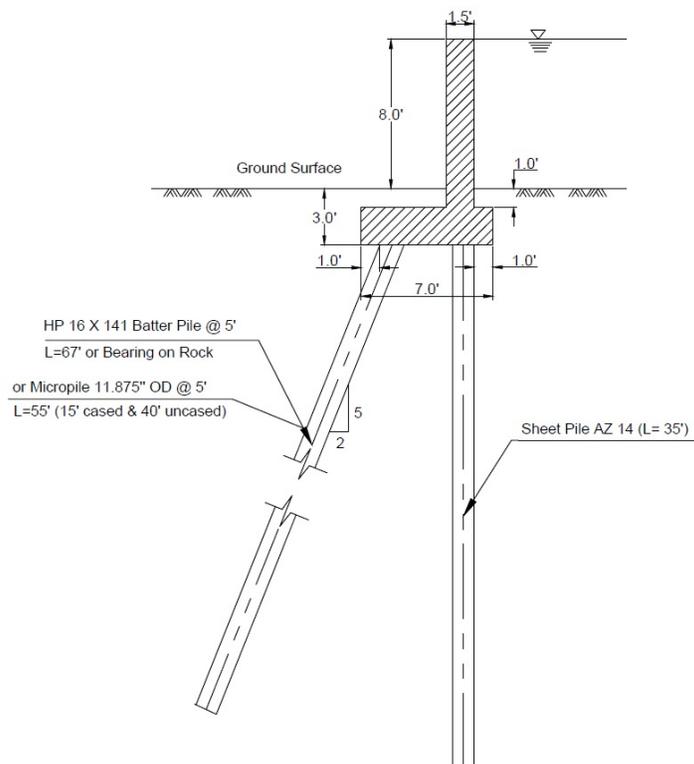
Cross-section of 8 feet L-wall for Soil Areas 4 to 7
